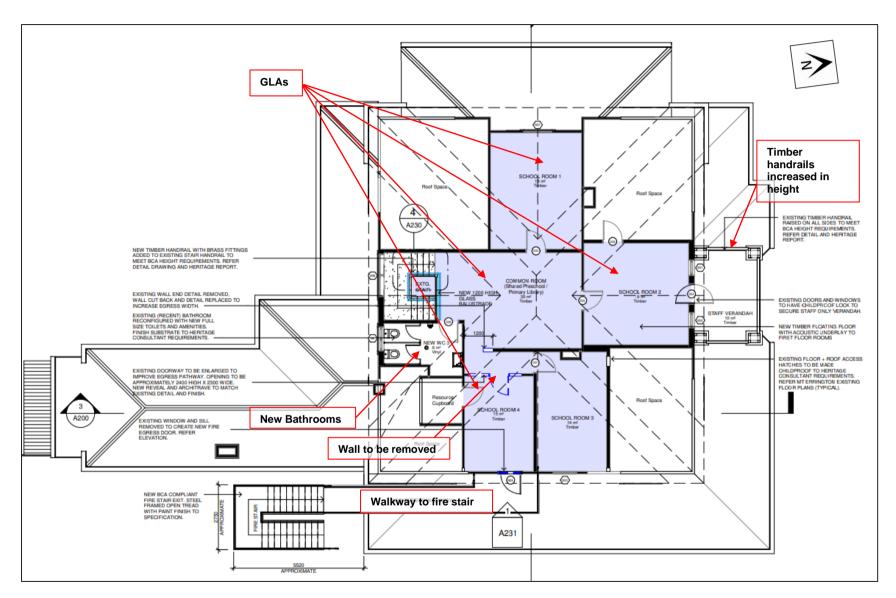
| Proposed First Floor Plan (Source: Applicant's SRTS 2020)
